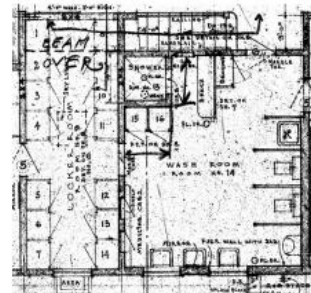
Drawing of wash room floor plan (W. Horace Austin, Sheet 8)
